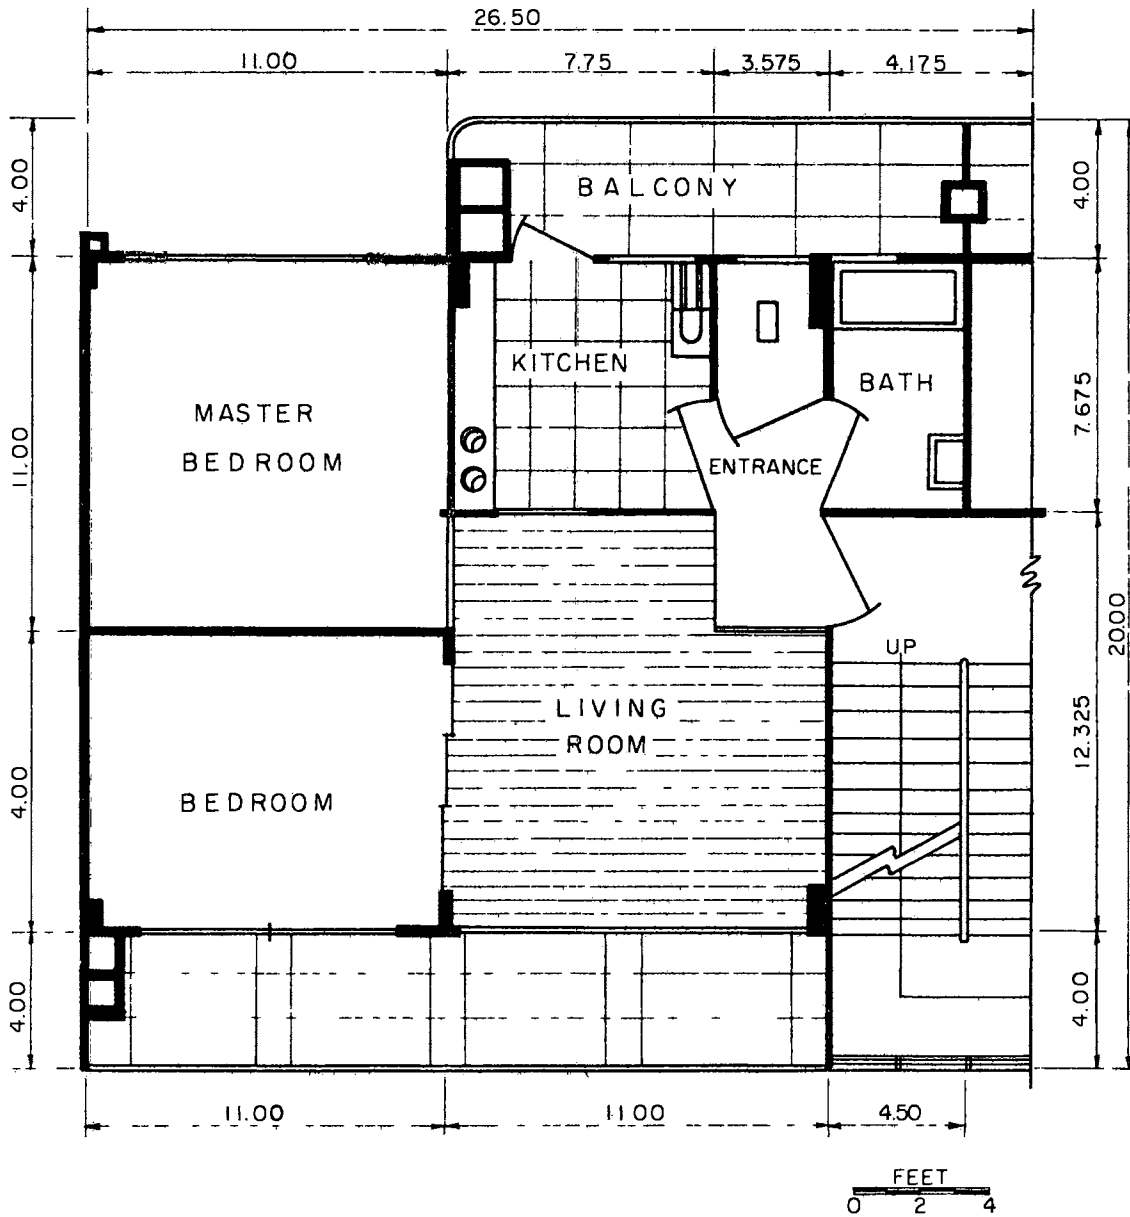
The Floor Plan of a Family Unit in Mapo Apartment Building
